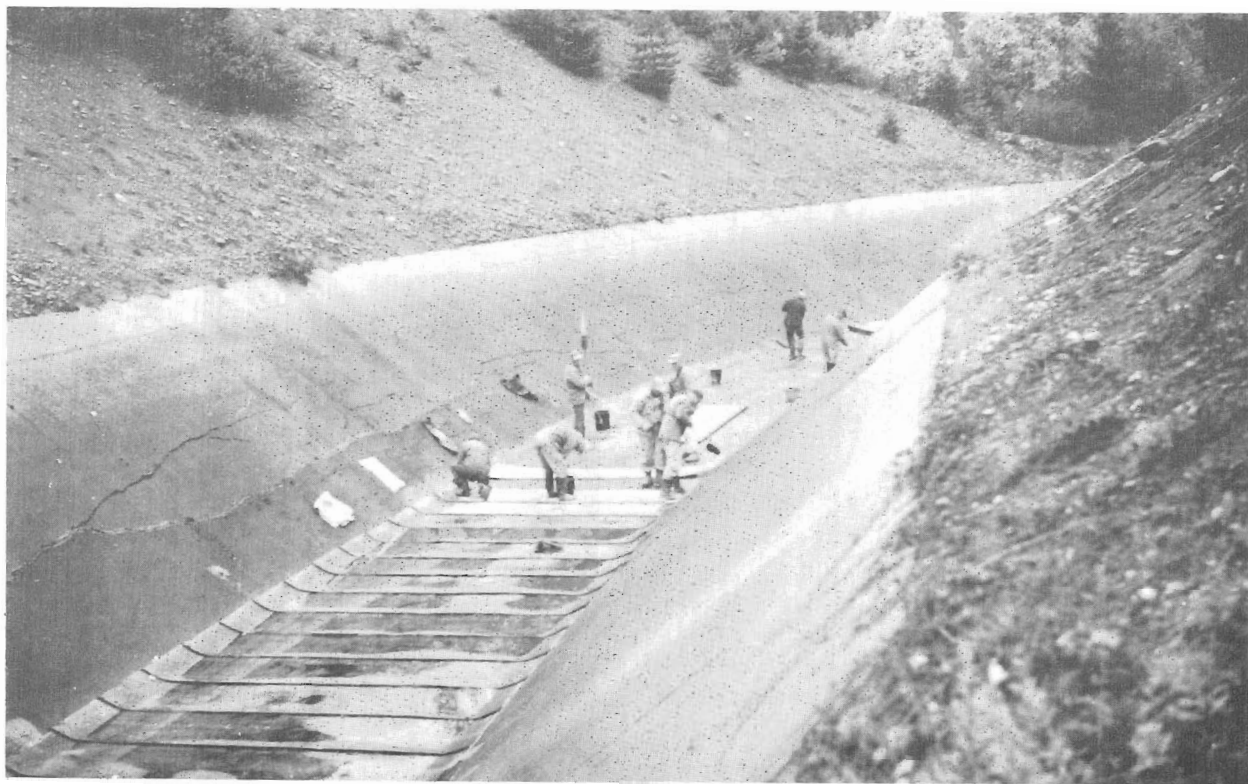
Installing 1/2-inch-thick exposed type prefabricated asphaltic material as a surface repair for deteriorated portland cement concrete lining. CH-467-11.
